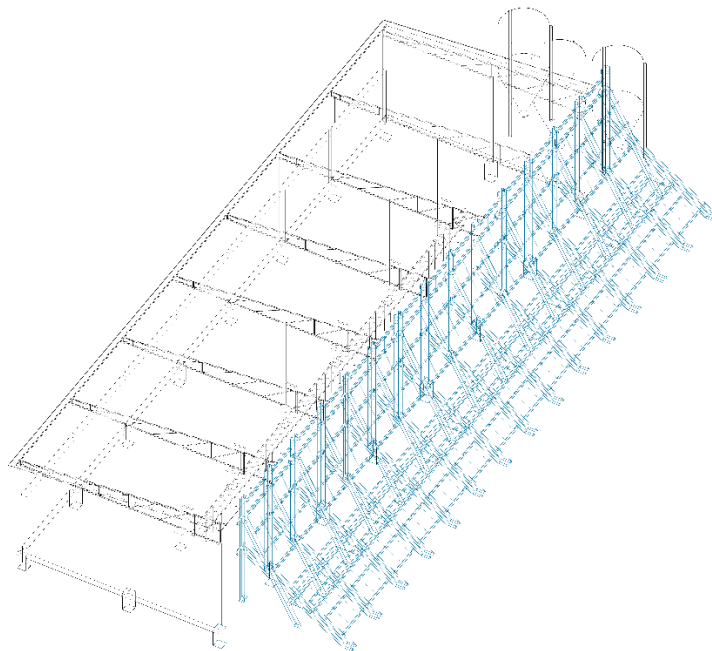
Worm's eye (viewing from beneath ground to expose structure) drawing of dining pavilion enclosure, timber and basalt assembly drawn in blue. Paired timber columns sandwich existing joist assemblies, offering reinforcement. Drawing by author, April 7, 2026.
